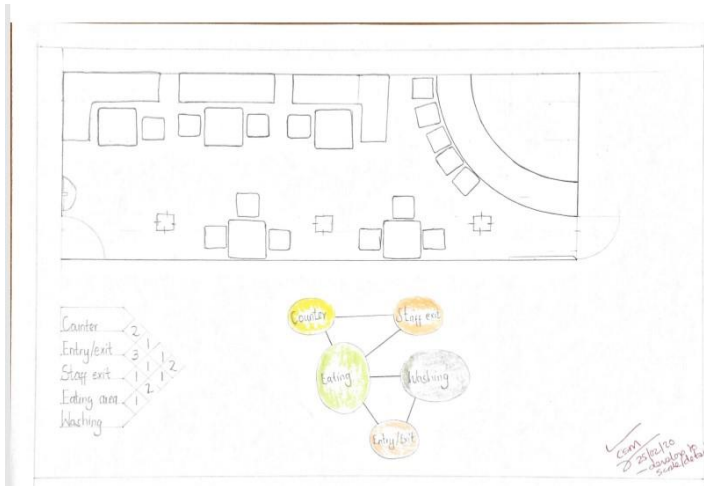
5 A sketch of proposed restaurant layout, Source: (Author, 2020)
